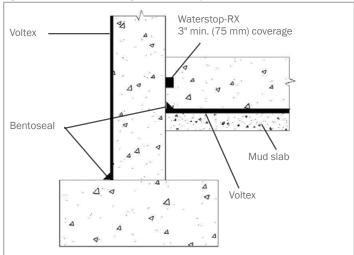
Raised slab detail with mud slab (non-hydrostatic)
